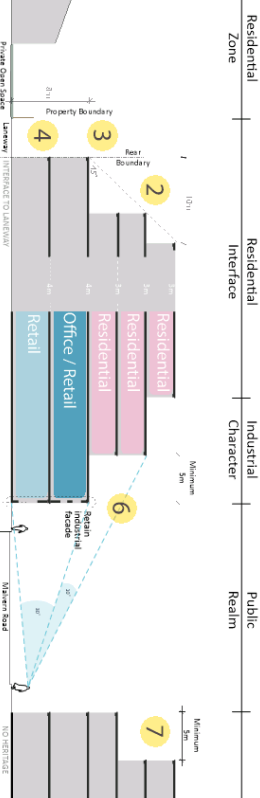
STREET SECTION AND LANEWAY INTERFACE – REAR
